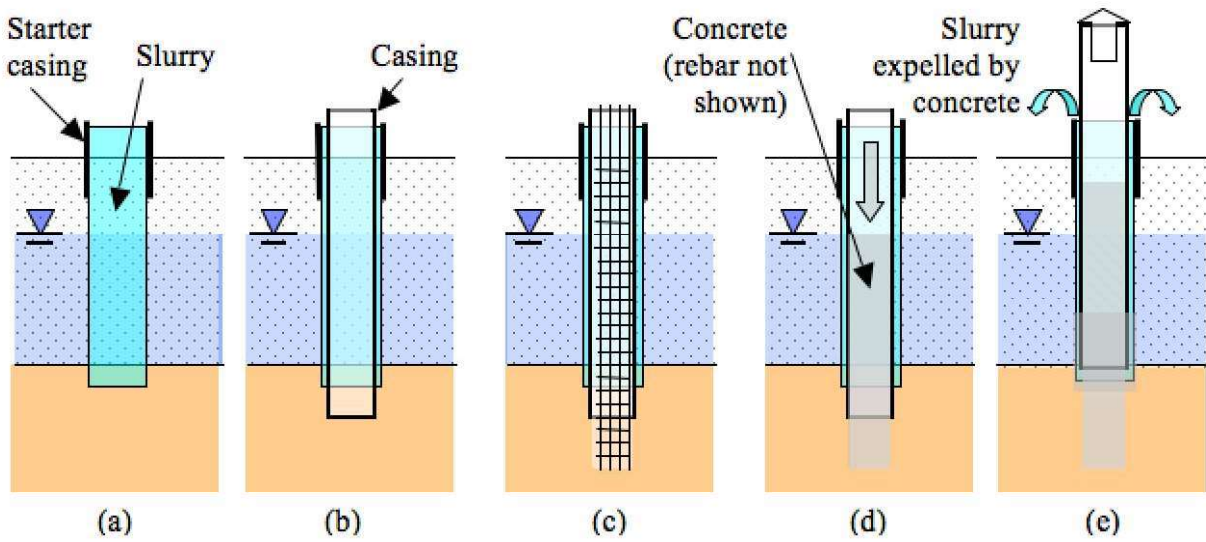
Construction Using Casing Through Slurry-Filled Starter Hole: (a) drill with slurry; (b) set casing and bail slurry; (c) complete and clean excavation, set reinforcing; (d) place concrete to head greater than external water pressure; (e) pull casing while adding concrete
